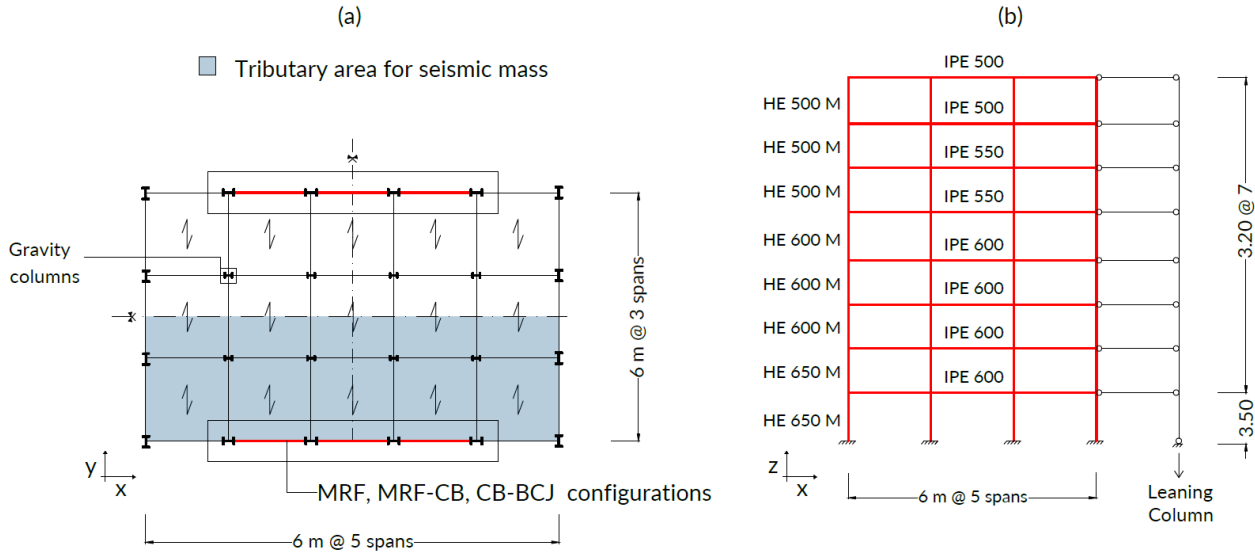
(a) Plan view and (b) Elevation view of the case study frame
